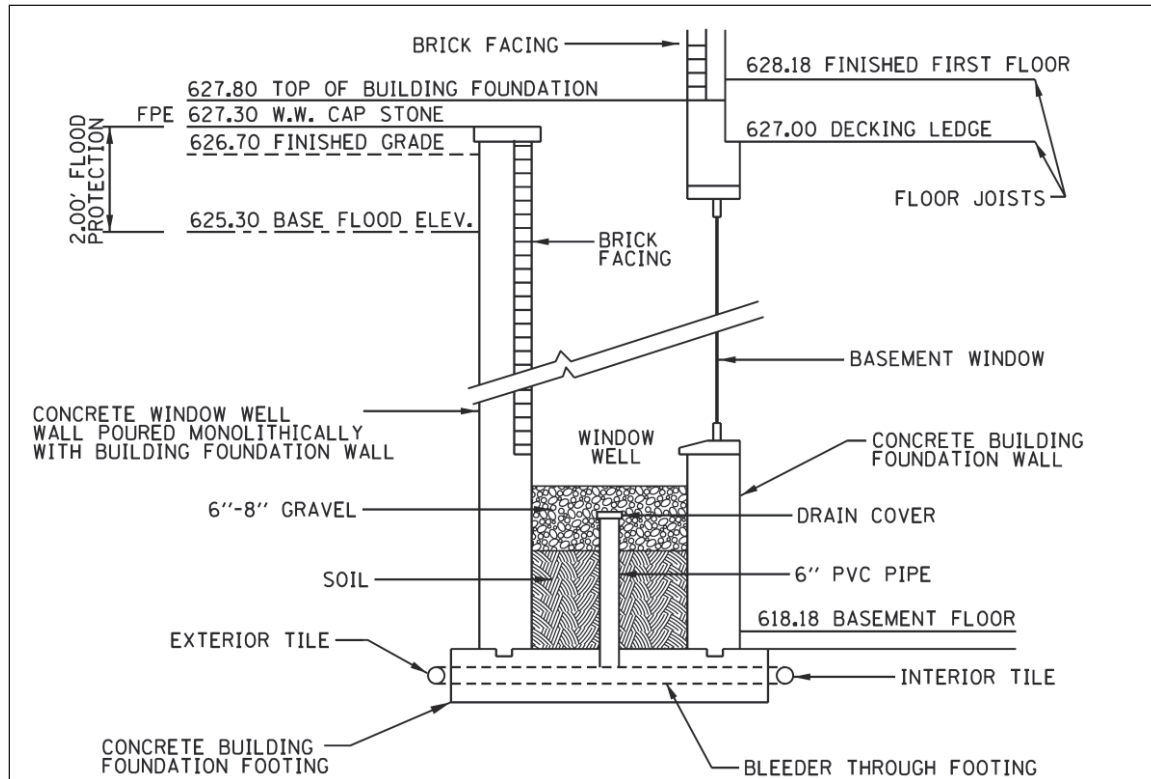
Waterproofed Window Well Elevated to the FPE
